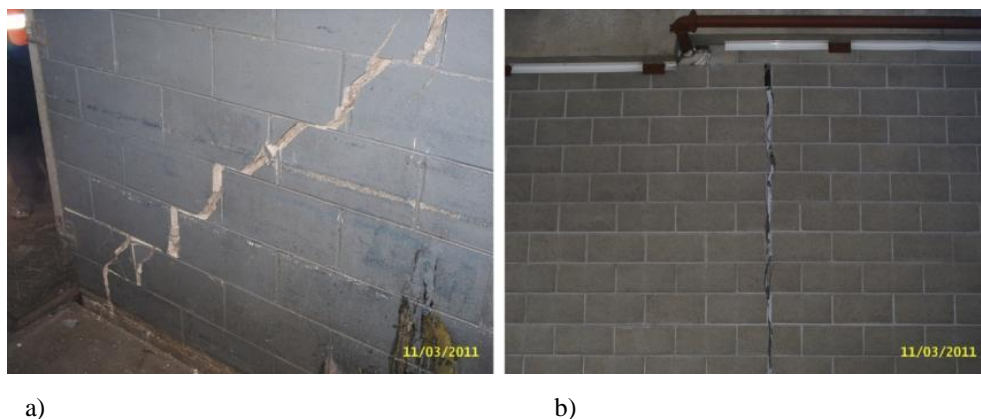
Observed damage on masonry infills after the 22nd February 2011 Christchurch earthquake: a-b) Sliding shear crack
